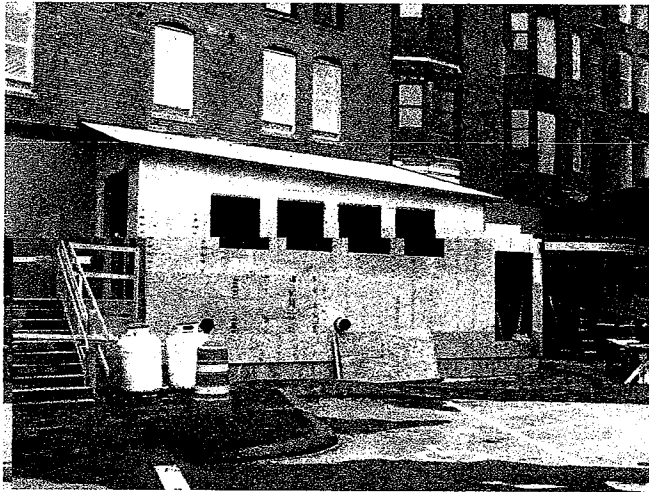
Back entrance exterior wall studs and sheathing being installed.
